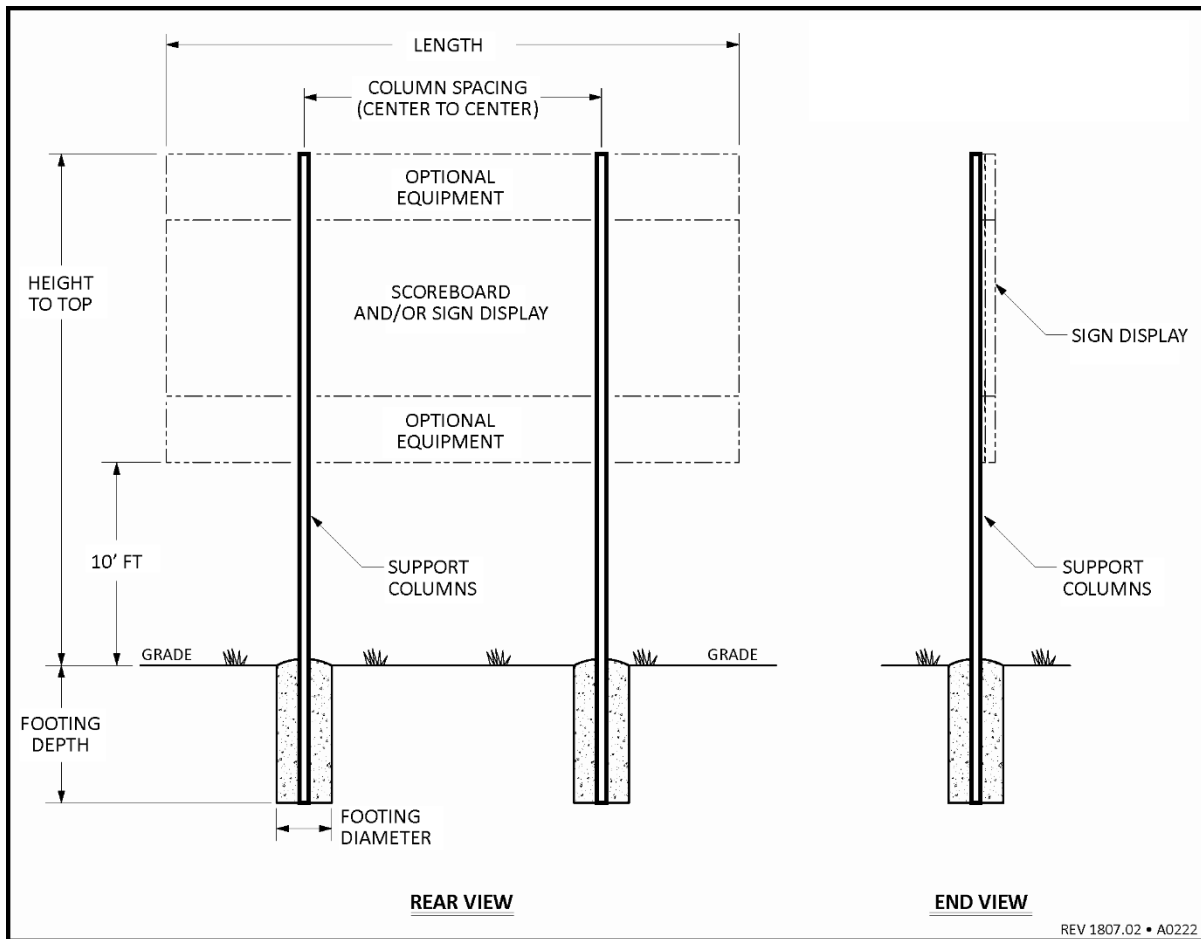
TYPICAL SUPPORT COLUMN STRUCTURE
